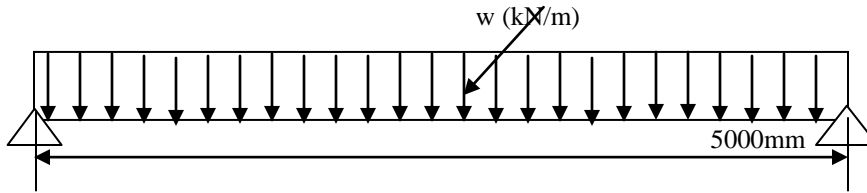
A: Loading on Simply Supported Nigerian grown Apa timber bridge beam
